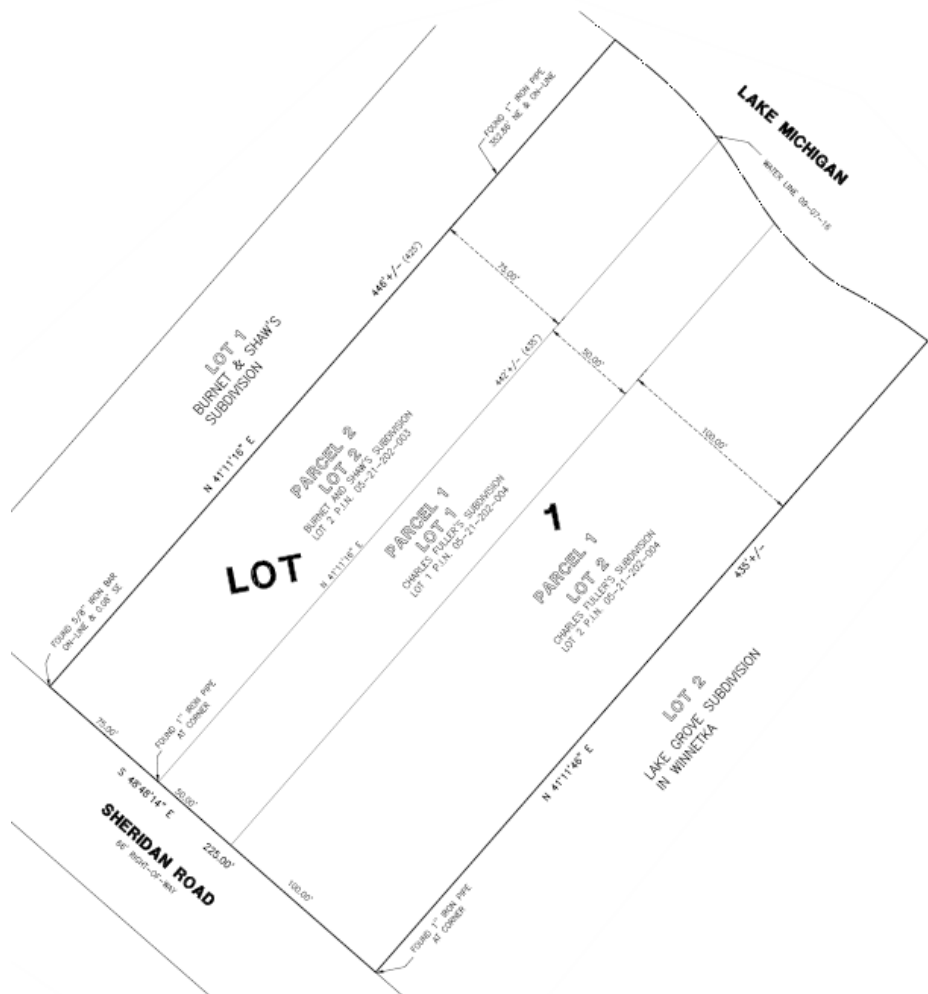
Excerpt of Proposed 419 & 429 Sheridan Consolidation Plat
